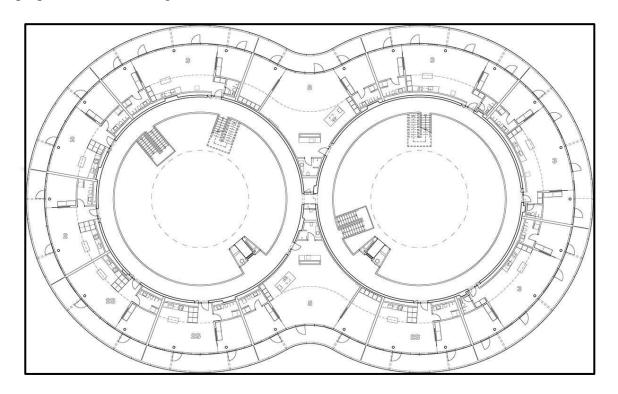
Typical floor plan, Gemini Residence, MVRDV, 2005 [223]
